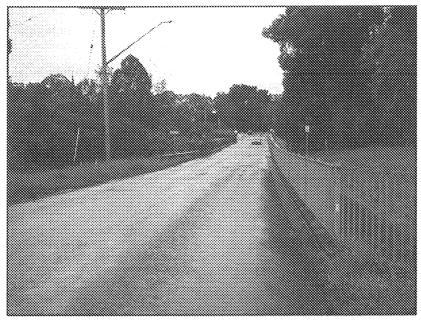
View south over the bridge crossing on Winterton Parade. Note footpath to right hand side of photo
